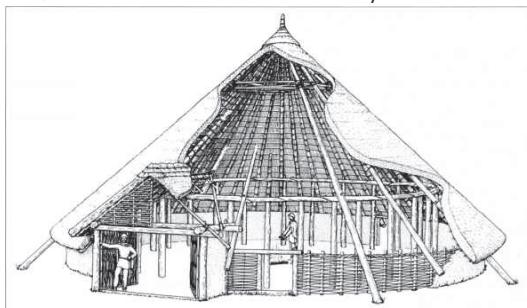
Reconstruction of a British house from the Iron Age on a circle plan (roundhouse) – ground floor walls usually skeletal, covered with clay.
